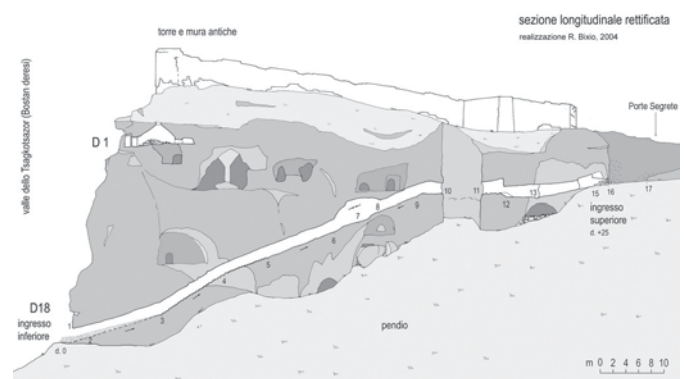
Ani, longitudinal section of the Orchard tunnel (or Secret Gates) (topography R. Bixio, V. Caloi, V. Castellani, M. Traverso; drawing R. Bixio)
